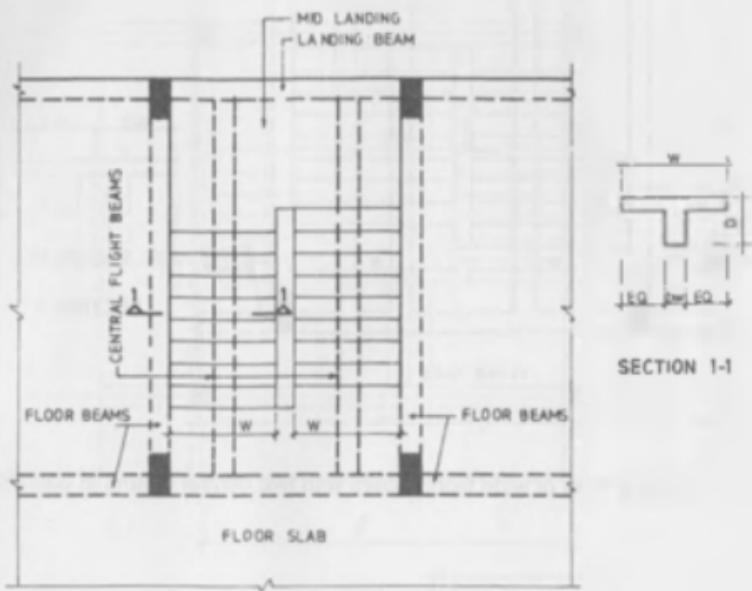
Plan of two-flight stairs with central flight beams.
